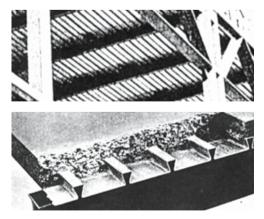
(top) Soffit of profiled metal sheeting; (bottom) profiled metal sheeting with concrete topping
